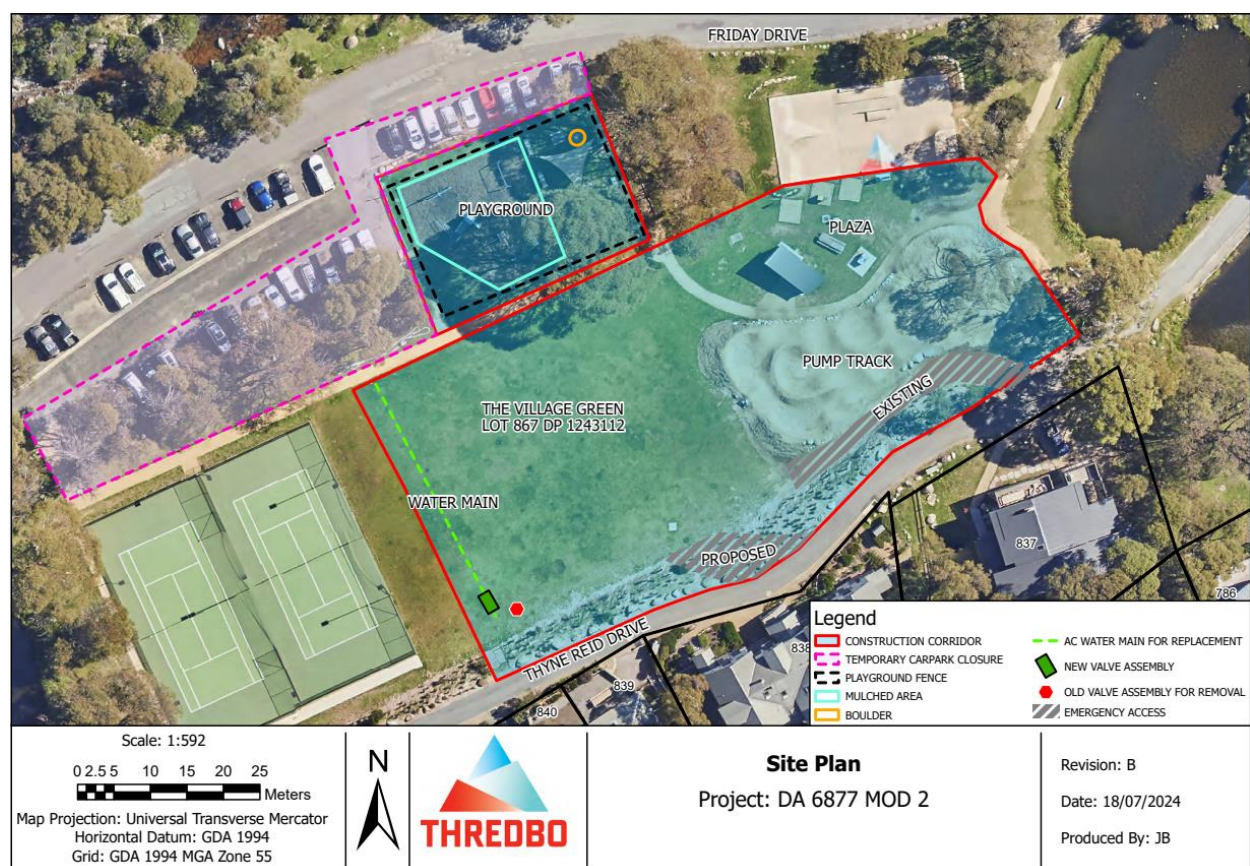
| Site Plan. Project: Thredbo Playground Upgrade (source: Statement of Environmental Effects [SEE])
